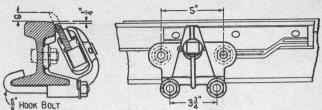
E. Z. MOTION PLATE RAIL CLIP, HOOK BOLT TYPE
